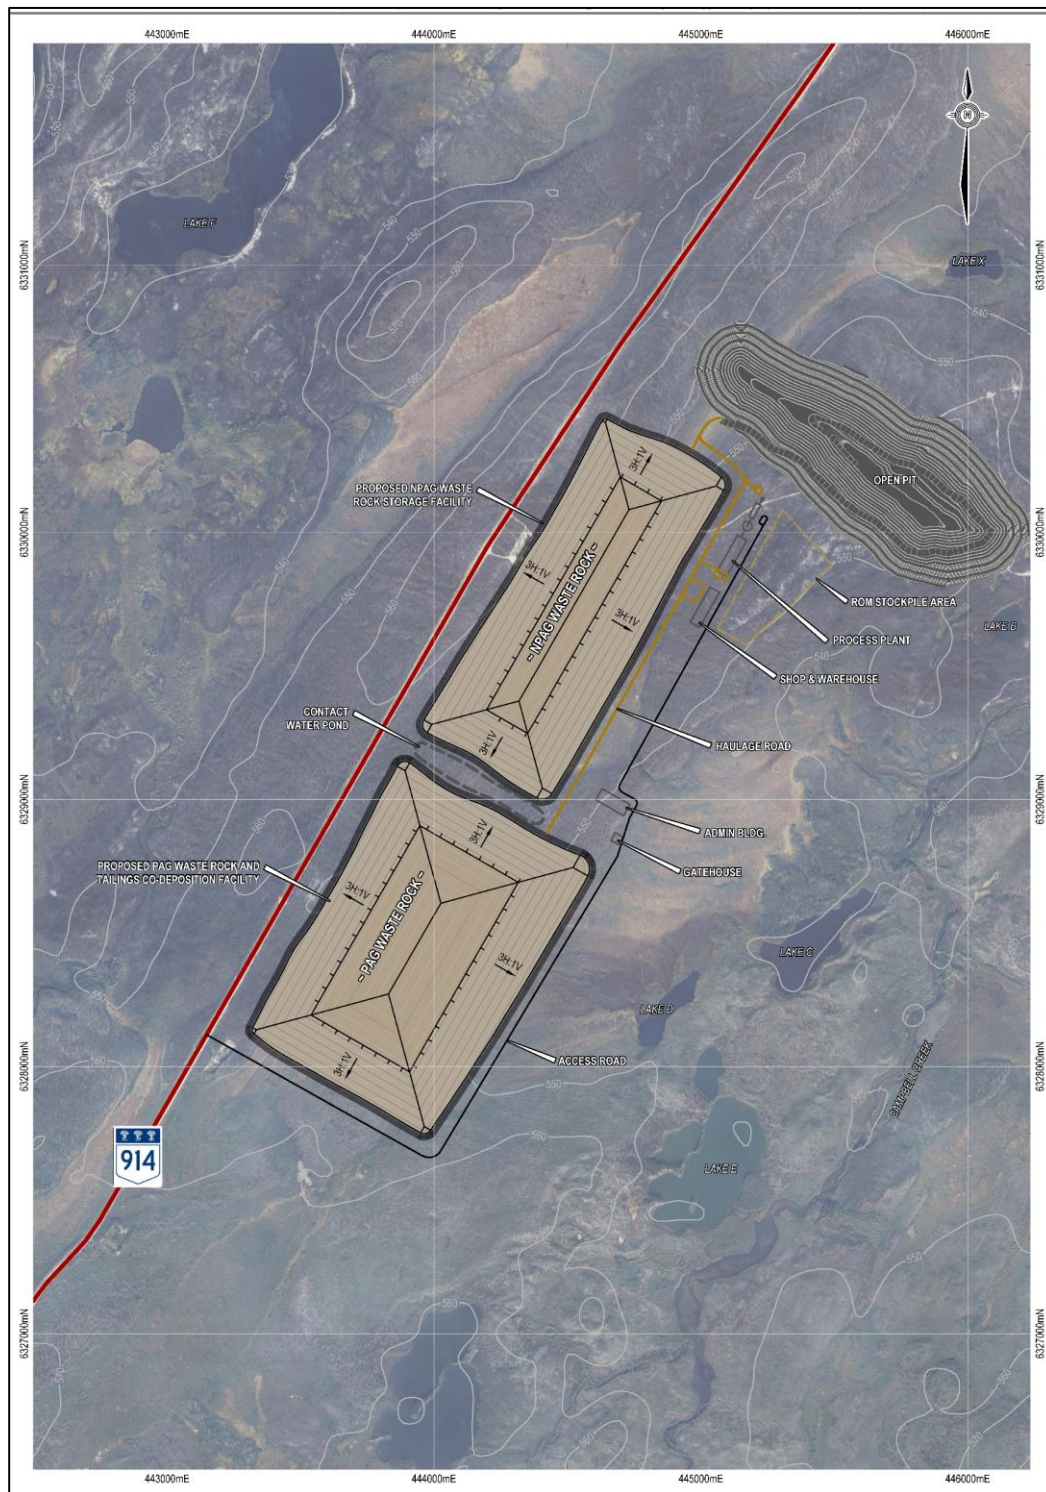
Loki Flake PEA Overall Site General Arrangement Plan
